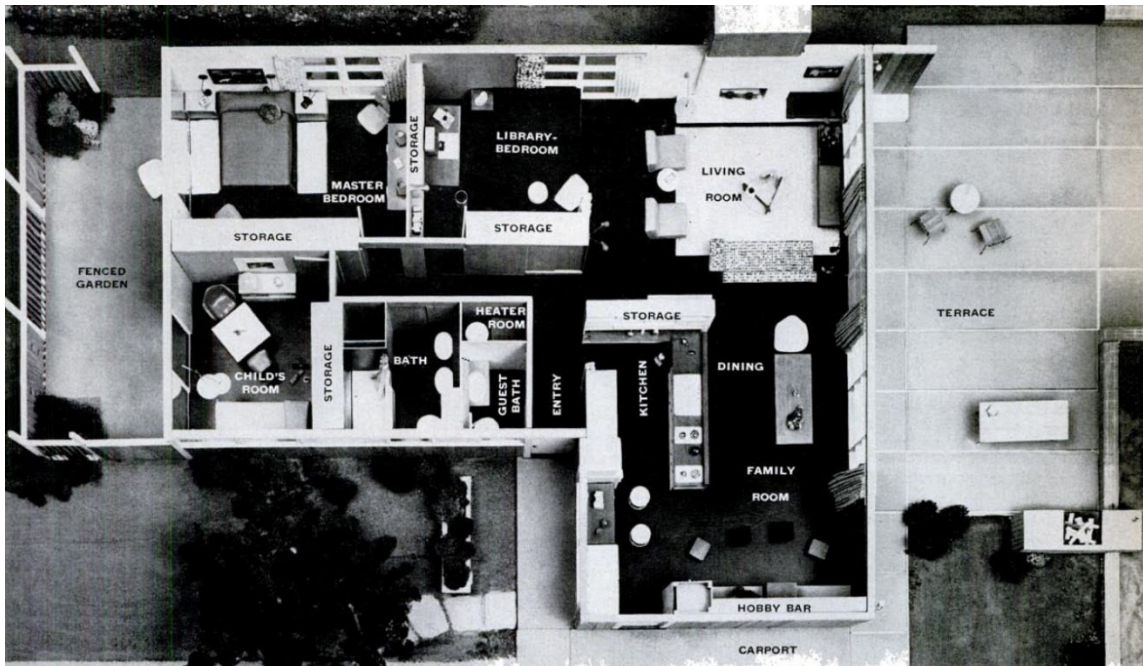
Floor plan of the 1953 NAHB Trade Secrets Houses showing storage wall construction and open kitchen. Source: *LIFE*, January 5, 1953, page 11.
